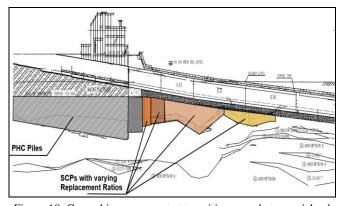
Ground improvement at transition zone between island and immersed tunnel
